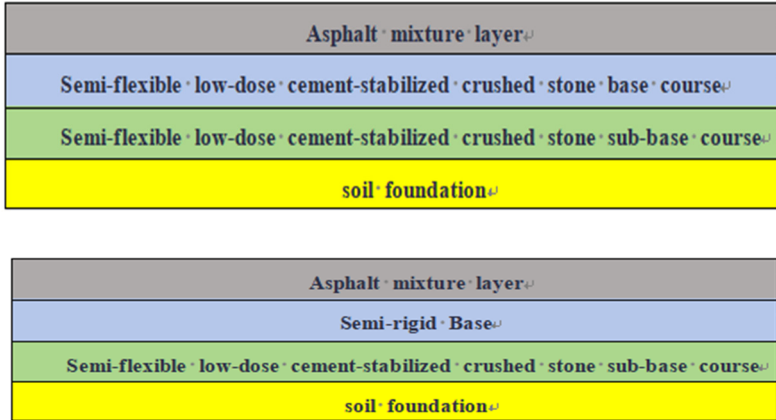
Pavement Structures of High-grade Highway for Structures 1 and 2
